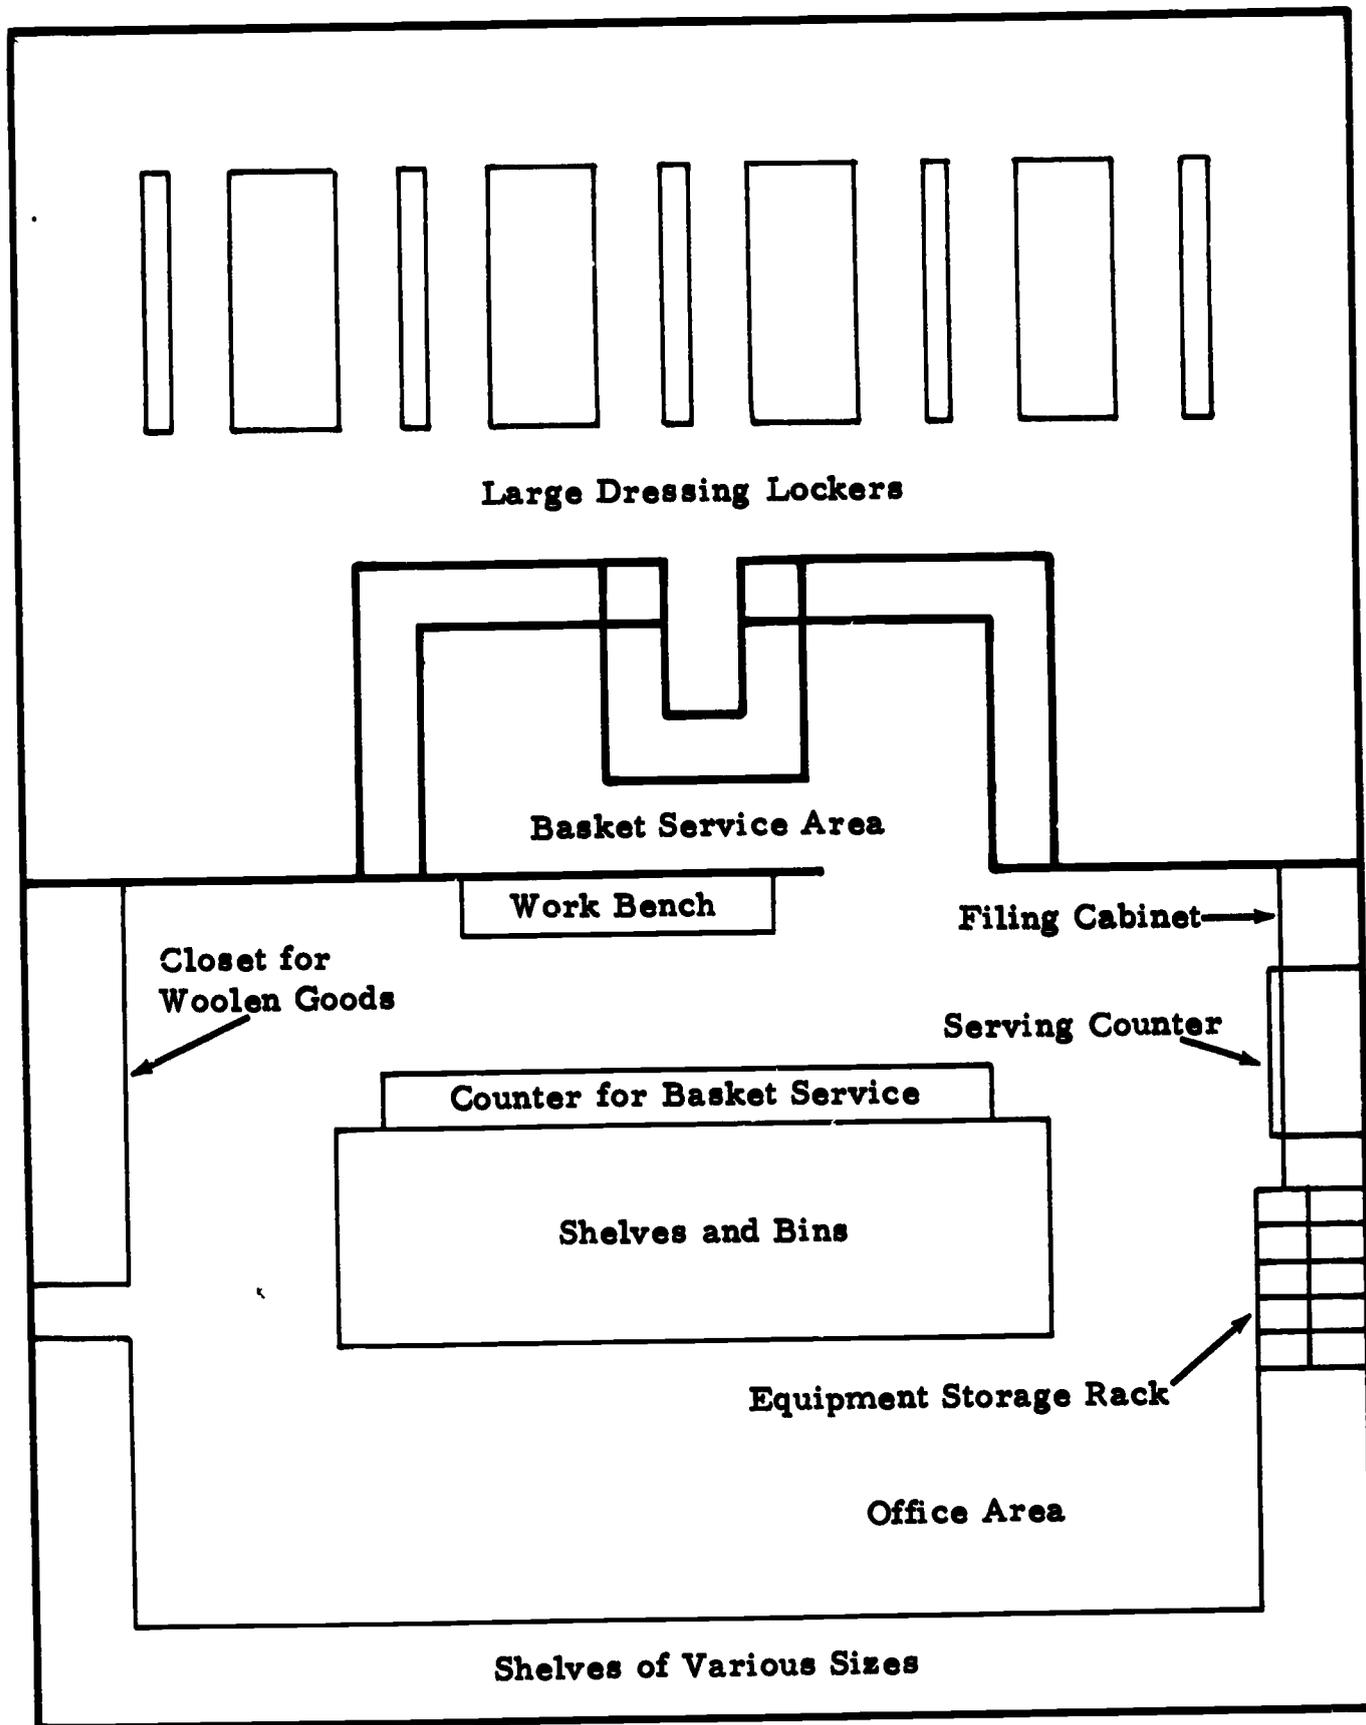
Layout of Locker and Equipment Supply Rooms, Depauw University
